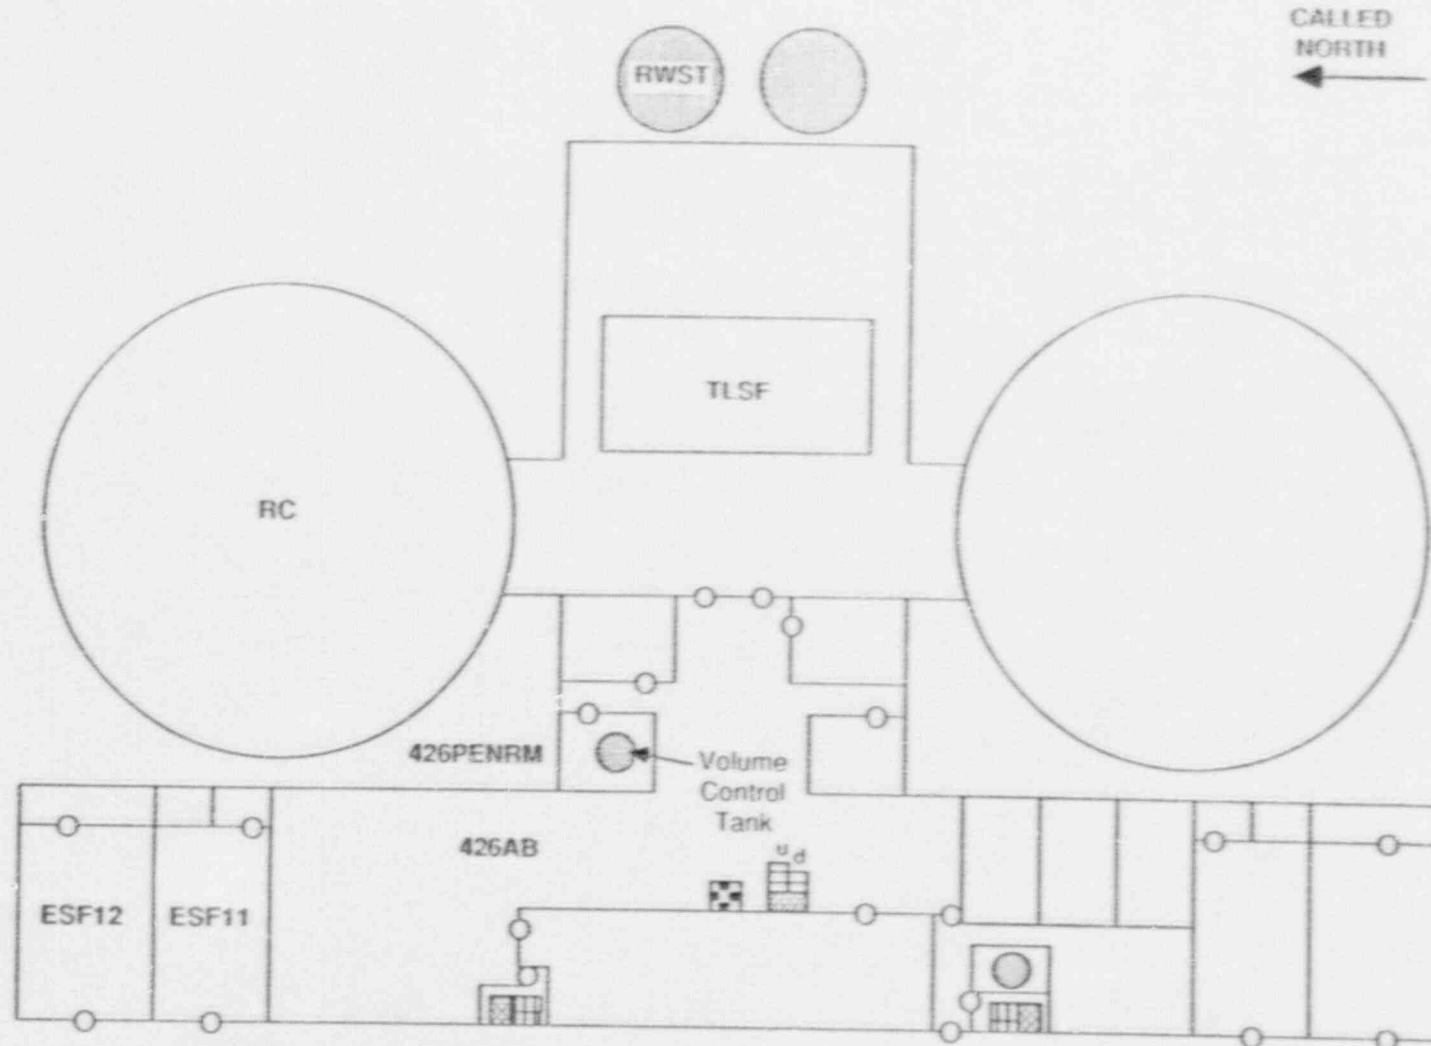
Braidwood 1 & 2 Station Arrangement, Elevation 426'
